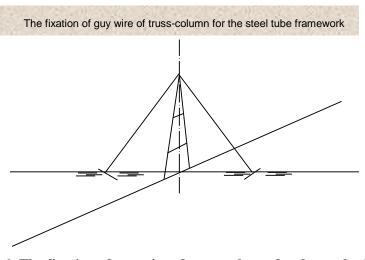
The fixation of guy wire of truss-column for the steel tube framework
